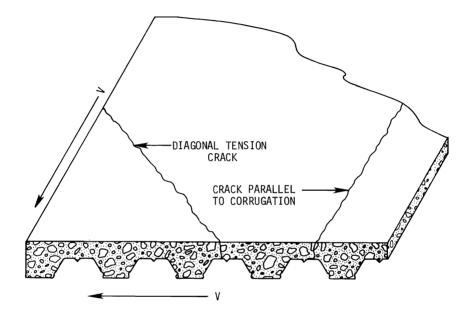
Failure by shearing of the concrete in a) diagonal tension and b) cracks parallel to the corrugations (Failure Mode la-1 and la-2 in Table 1).
